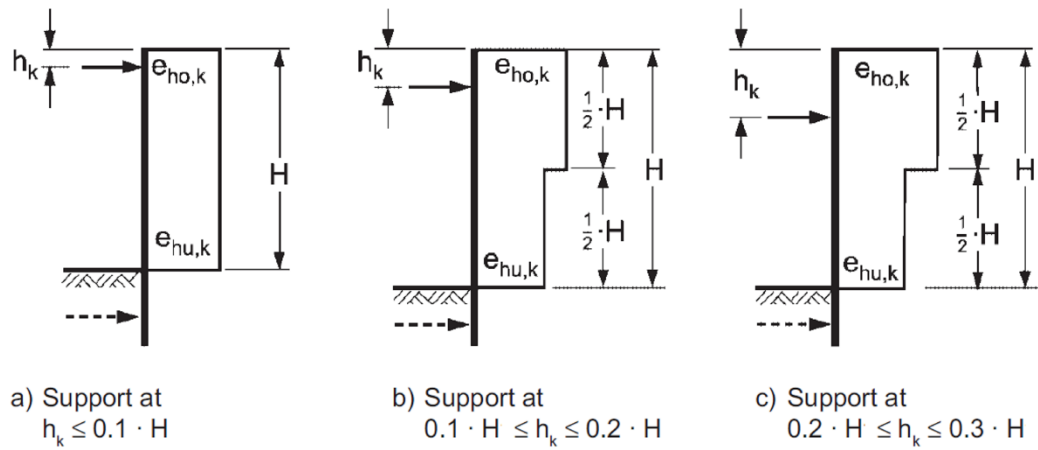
Pressure diagrams for single-supported sheet pile and concrete walls after EAB (2014)
